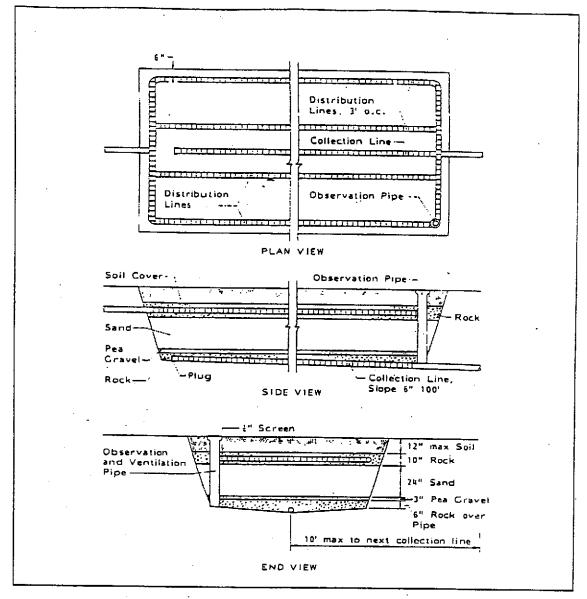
Buried sand filter. Source: Onsite Domestic Sewage Handbook, MWPS-24, Midwest Plan Service, 1982.
